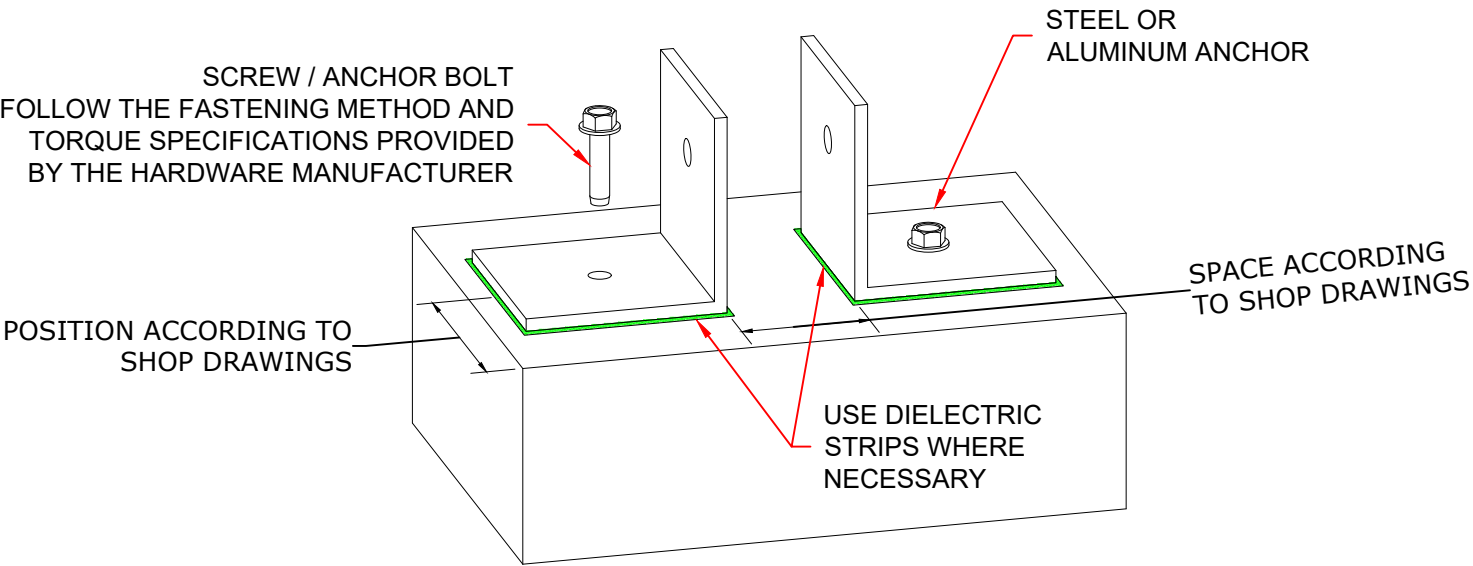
STANDARD SKYLIGHT CONNECTOR. REFER TO THE SHOP DRAWING FOR PARTICULARS
